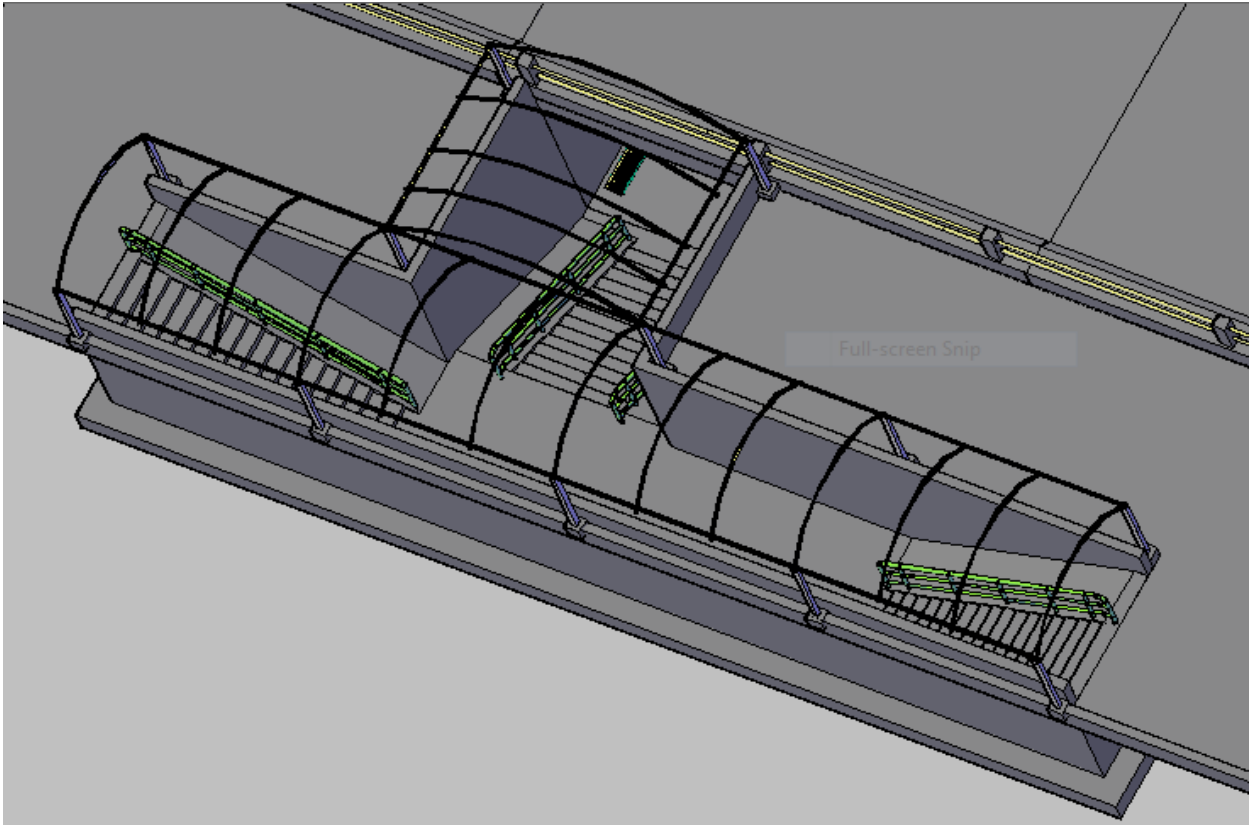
Underpass pedestrian crossing that connects the two sides of walkway on railway.
